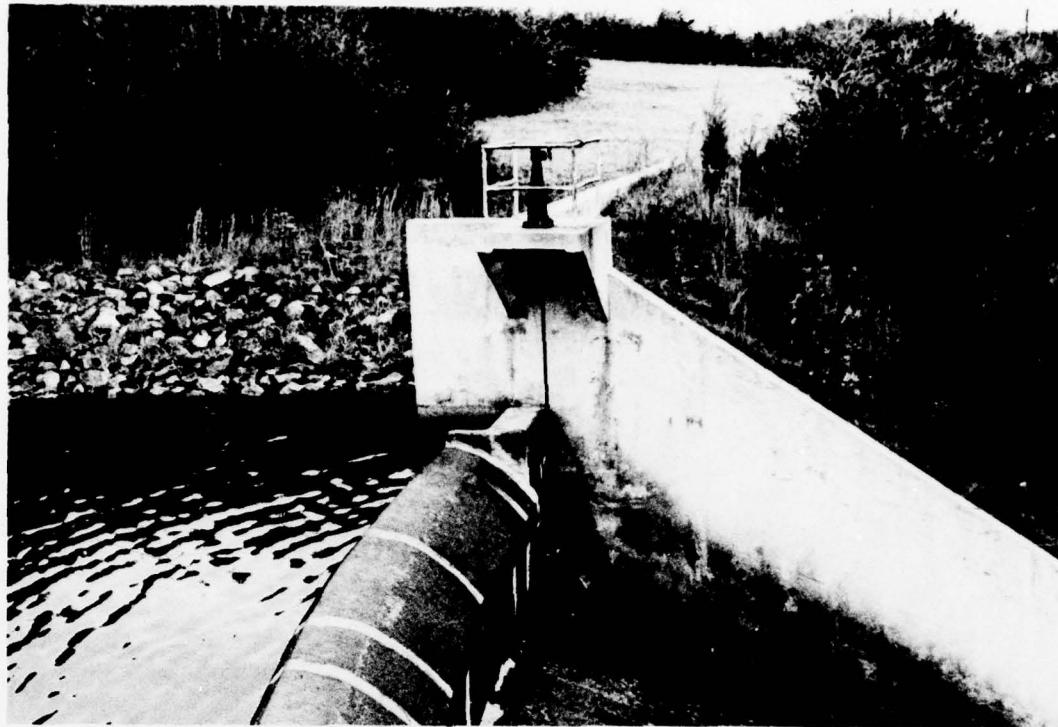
Riprapped Approach Channel, Concrete Overflow Weir, Lift Pedestal and Slide Gate
